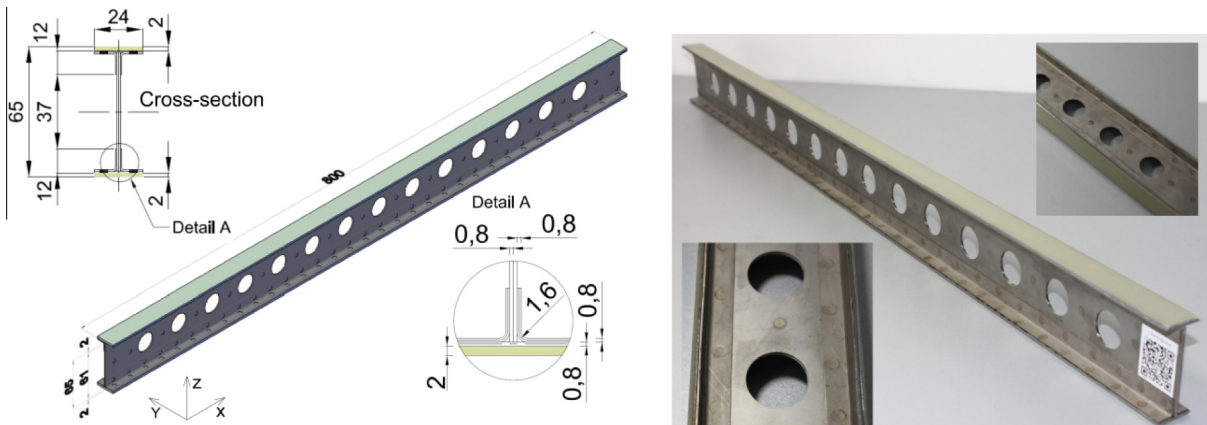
Geometry and photos of beams reinforced fiberglass sheets.
